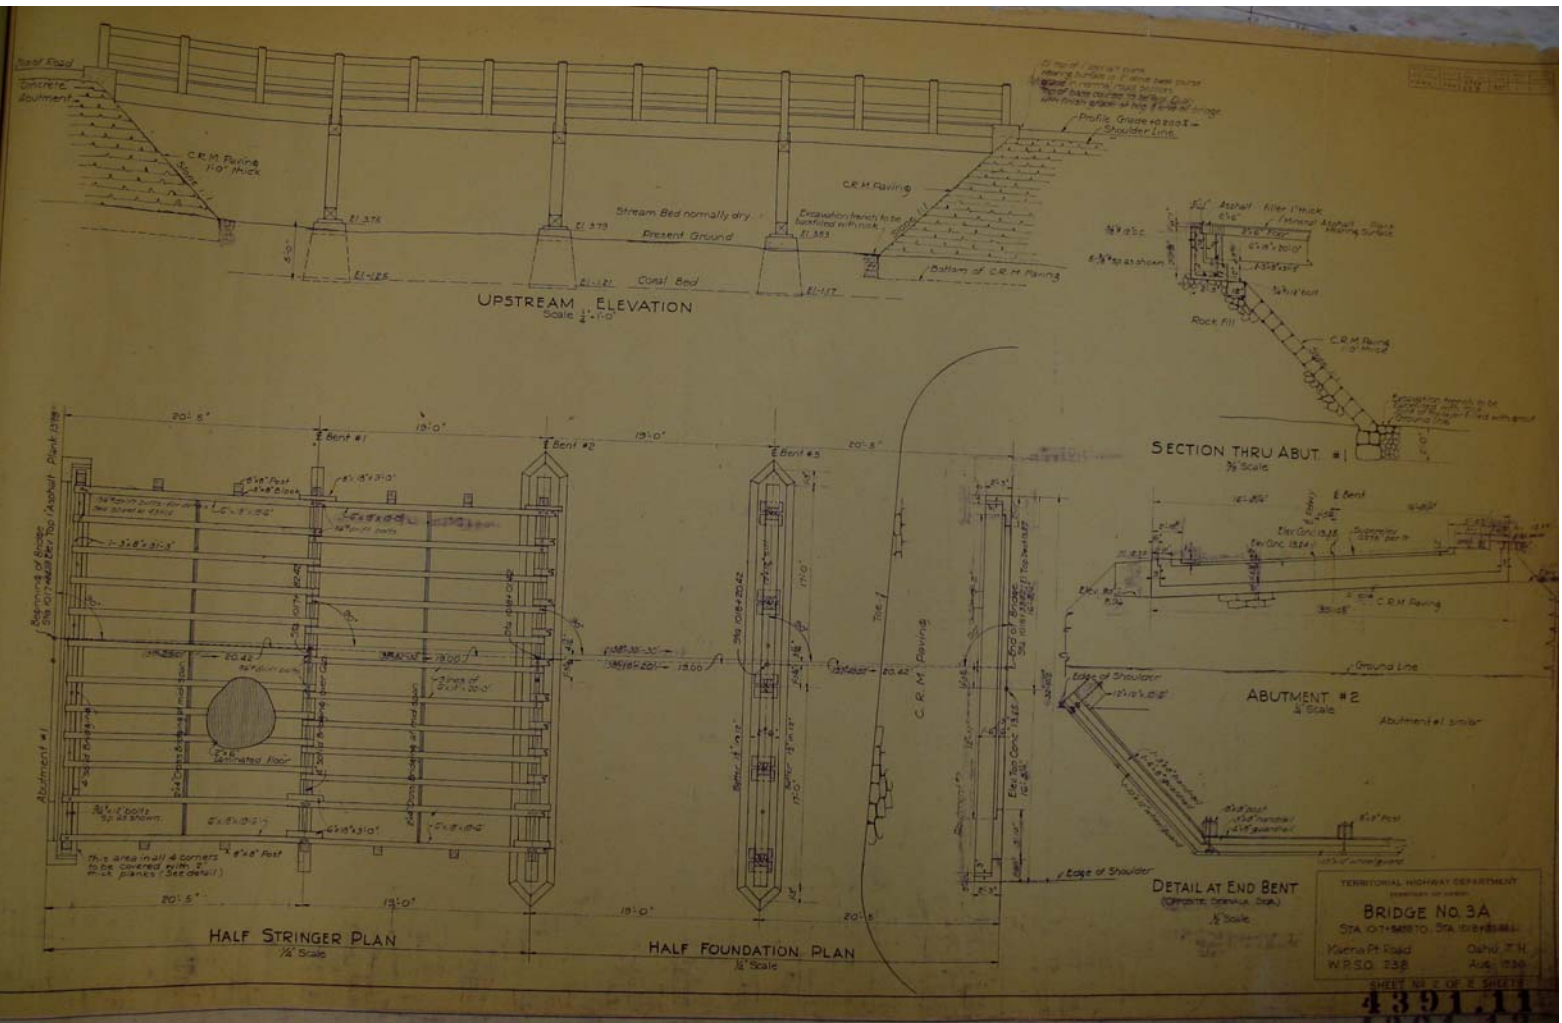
Original Drawing, Bridge No. 3A, Territory of Hawaii Public Works Department, Sheet 2 of 2
